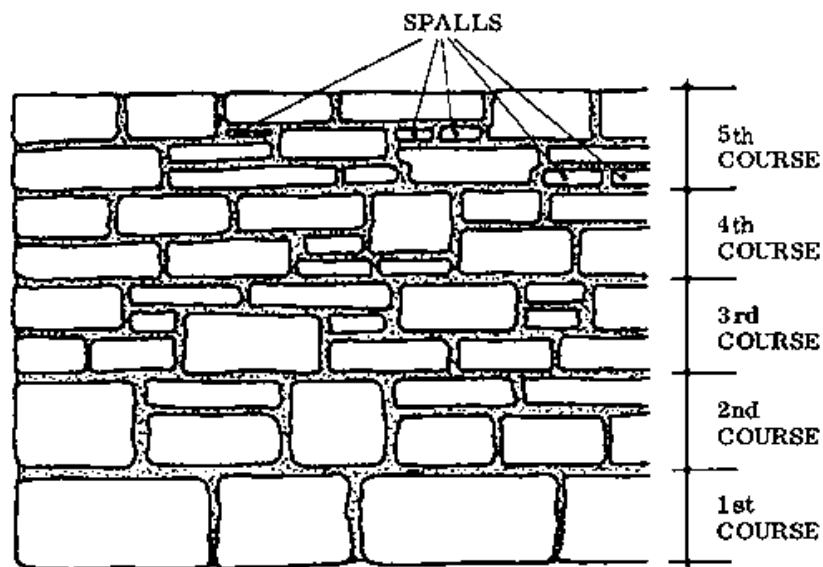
HAMMER-DRESSED ASHLAR MASONRY
